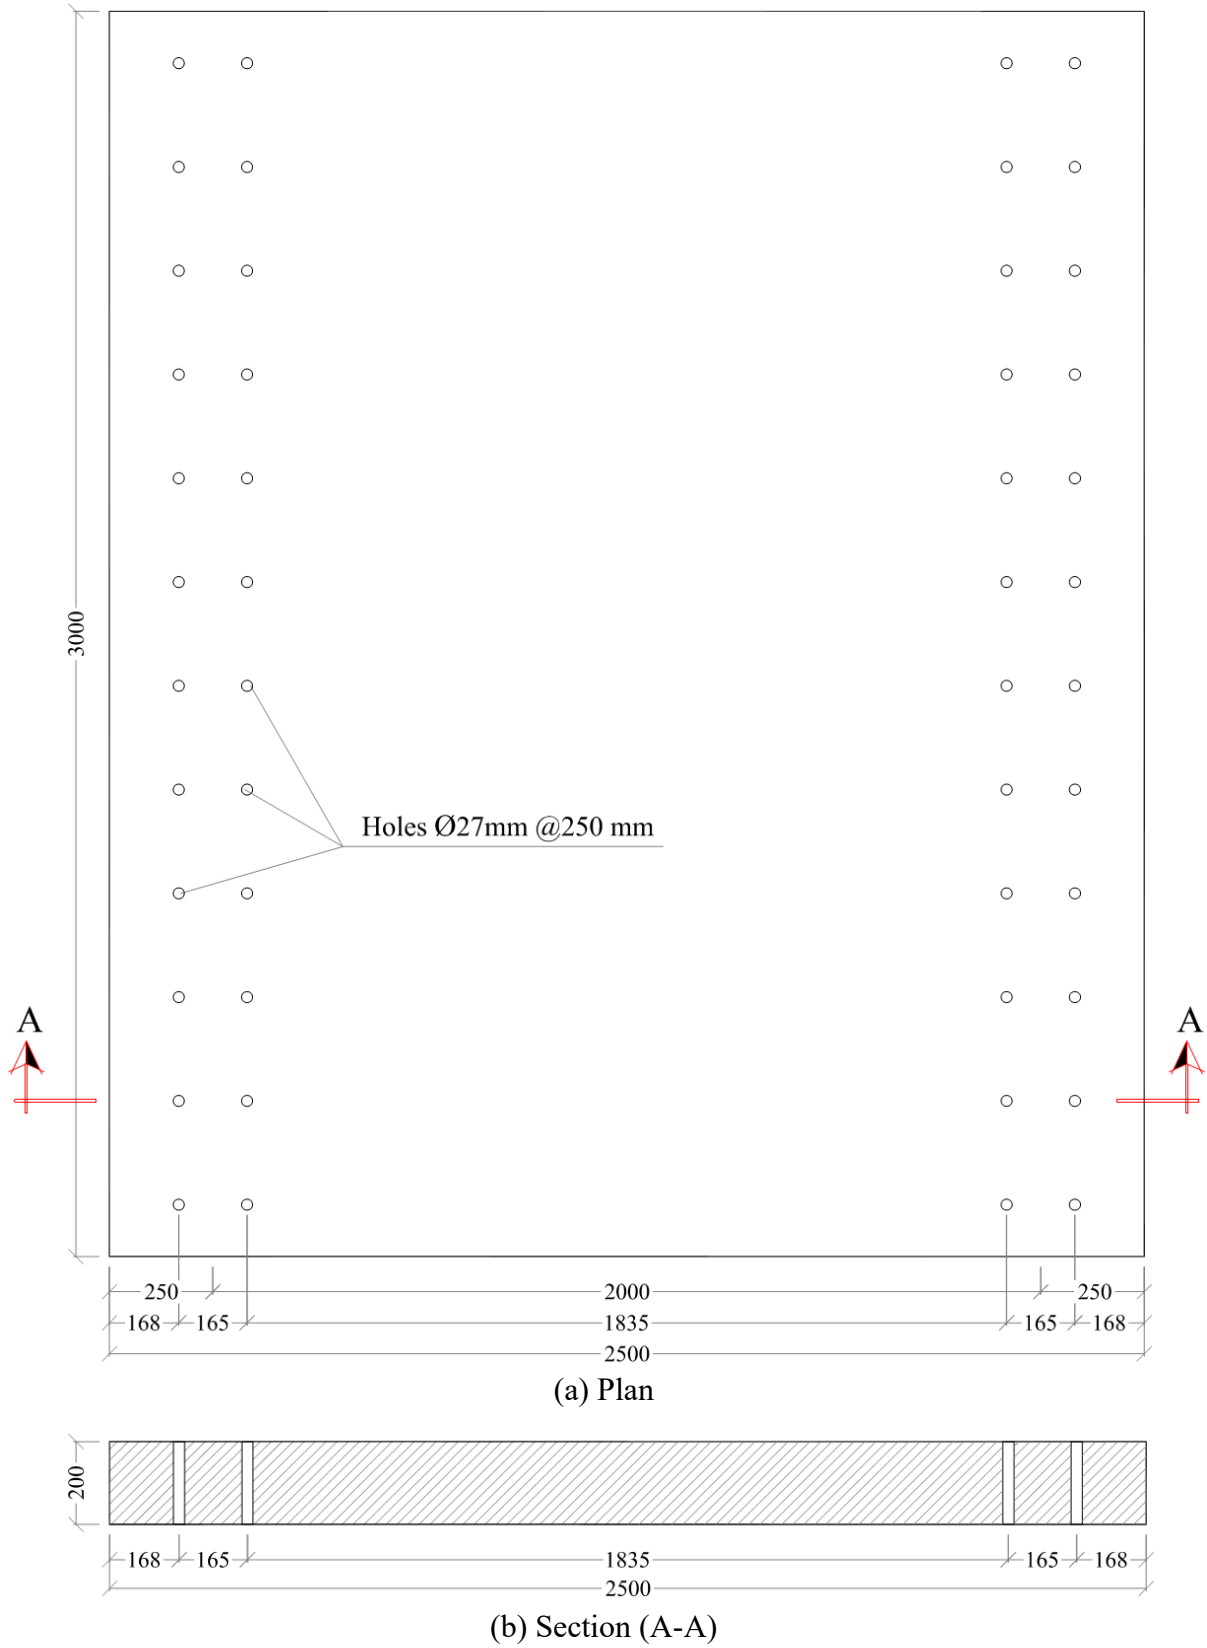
Geometry of the tested deck slabs (Dimensions in mm)
